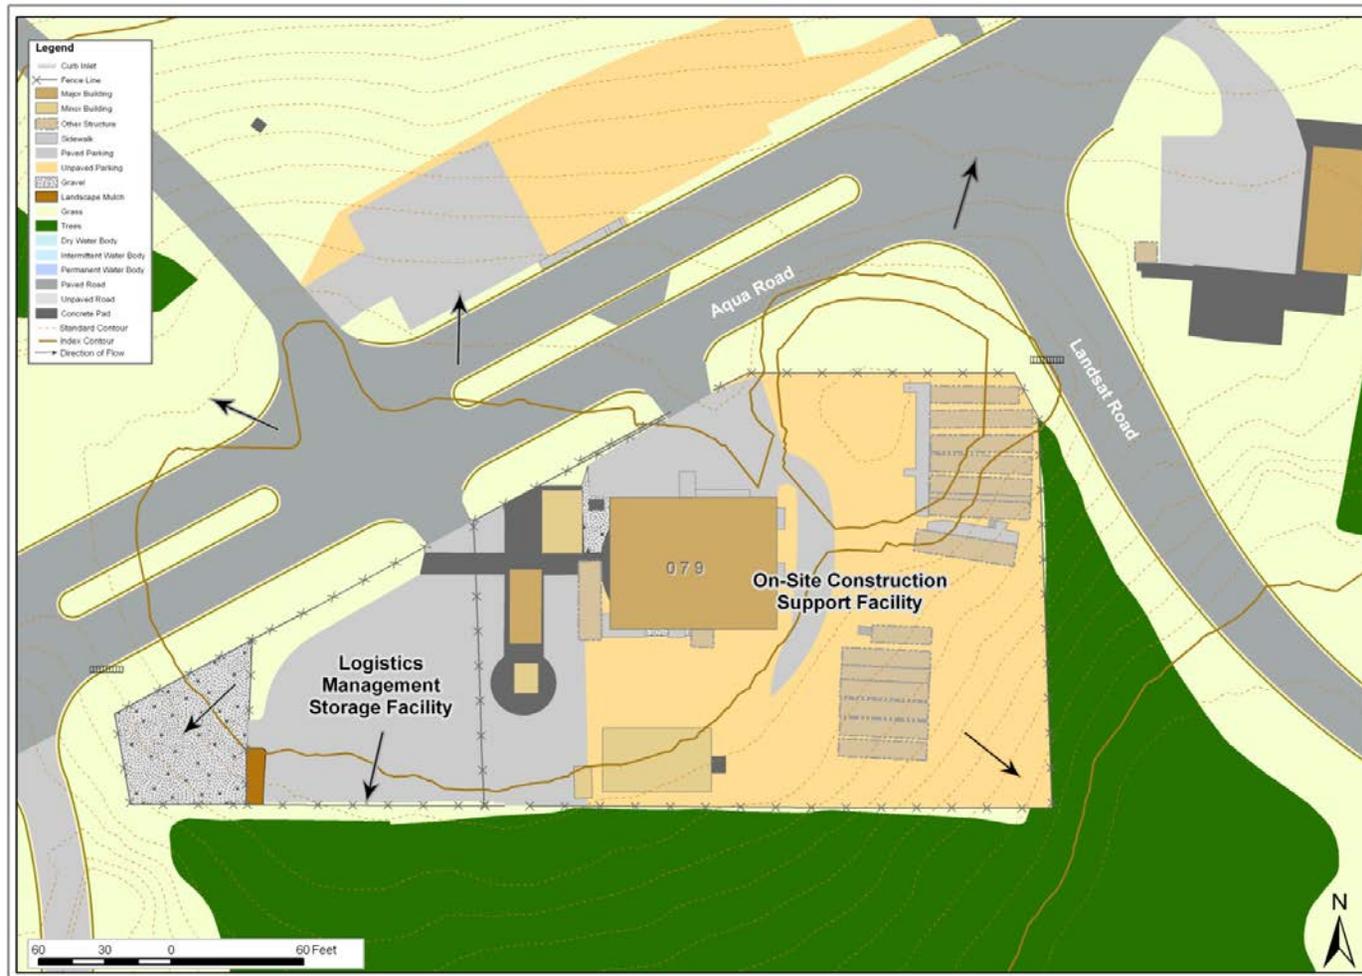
C: Location of On-Site Construction Support and Logistics Management Storage Facilities
